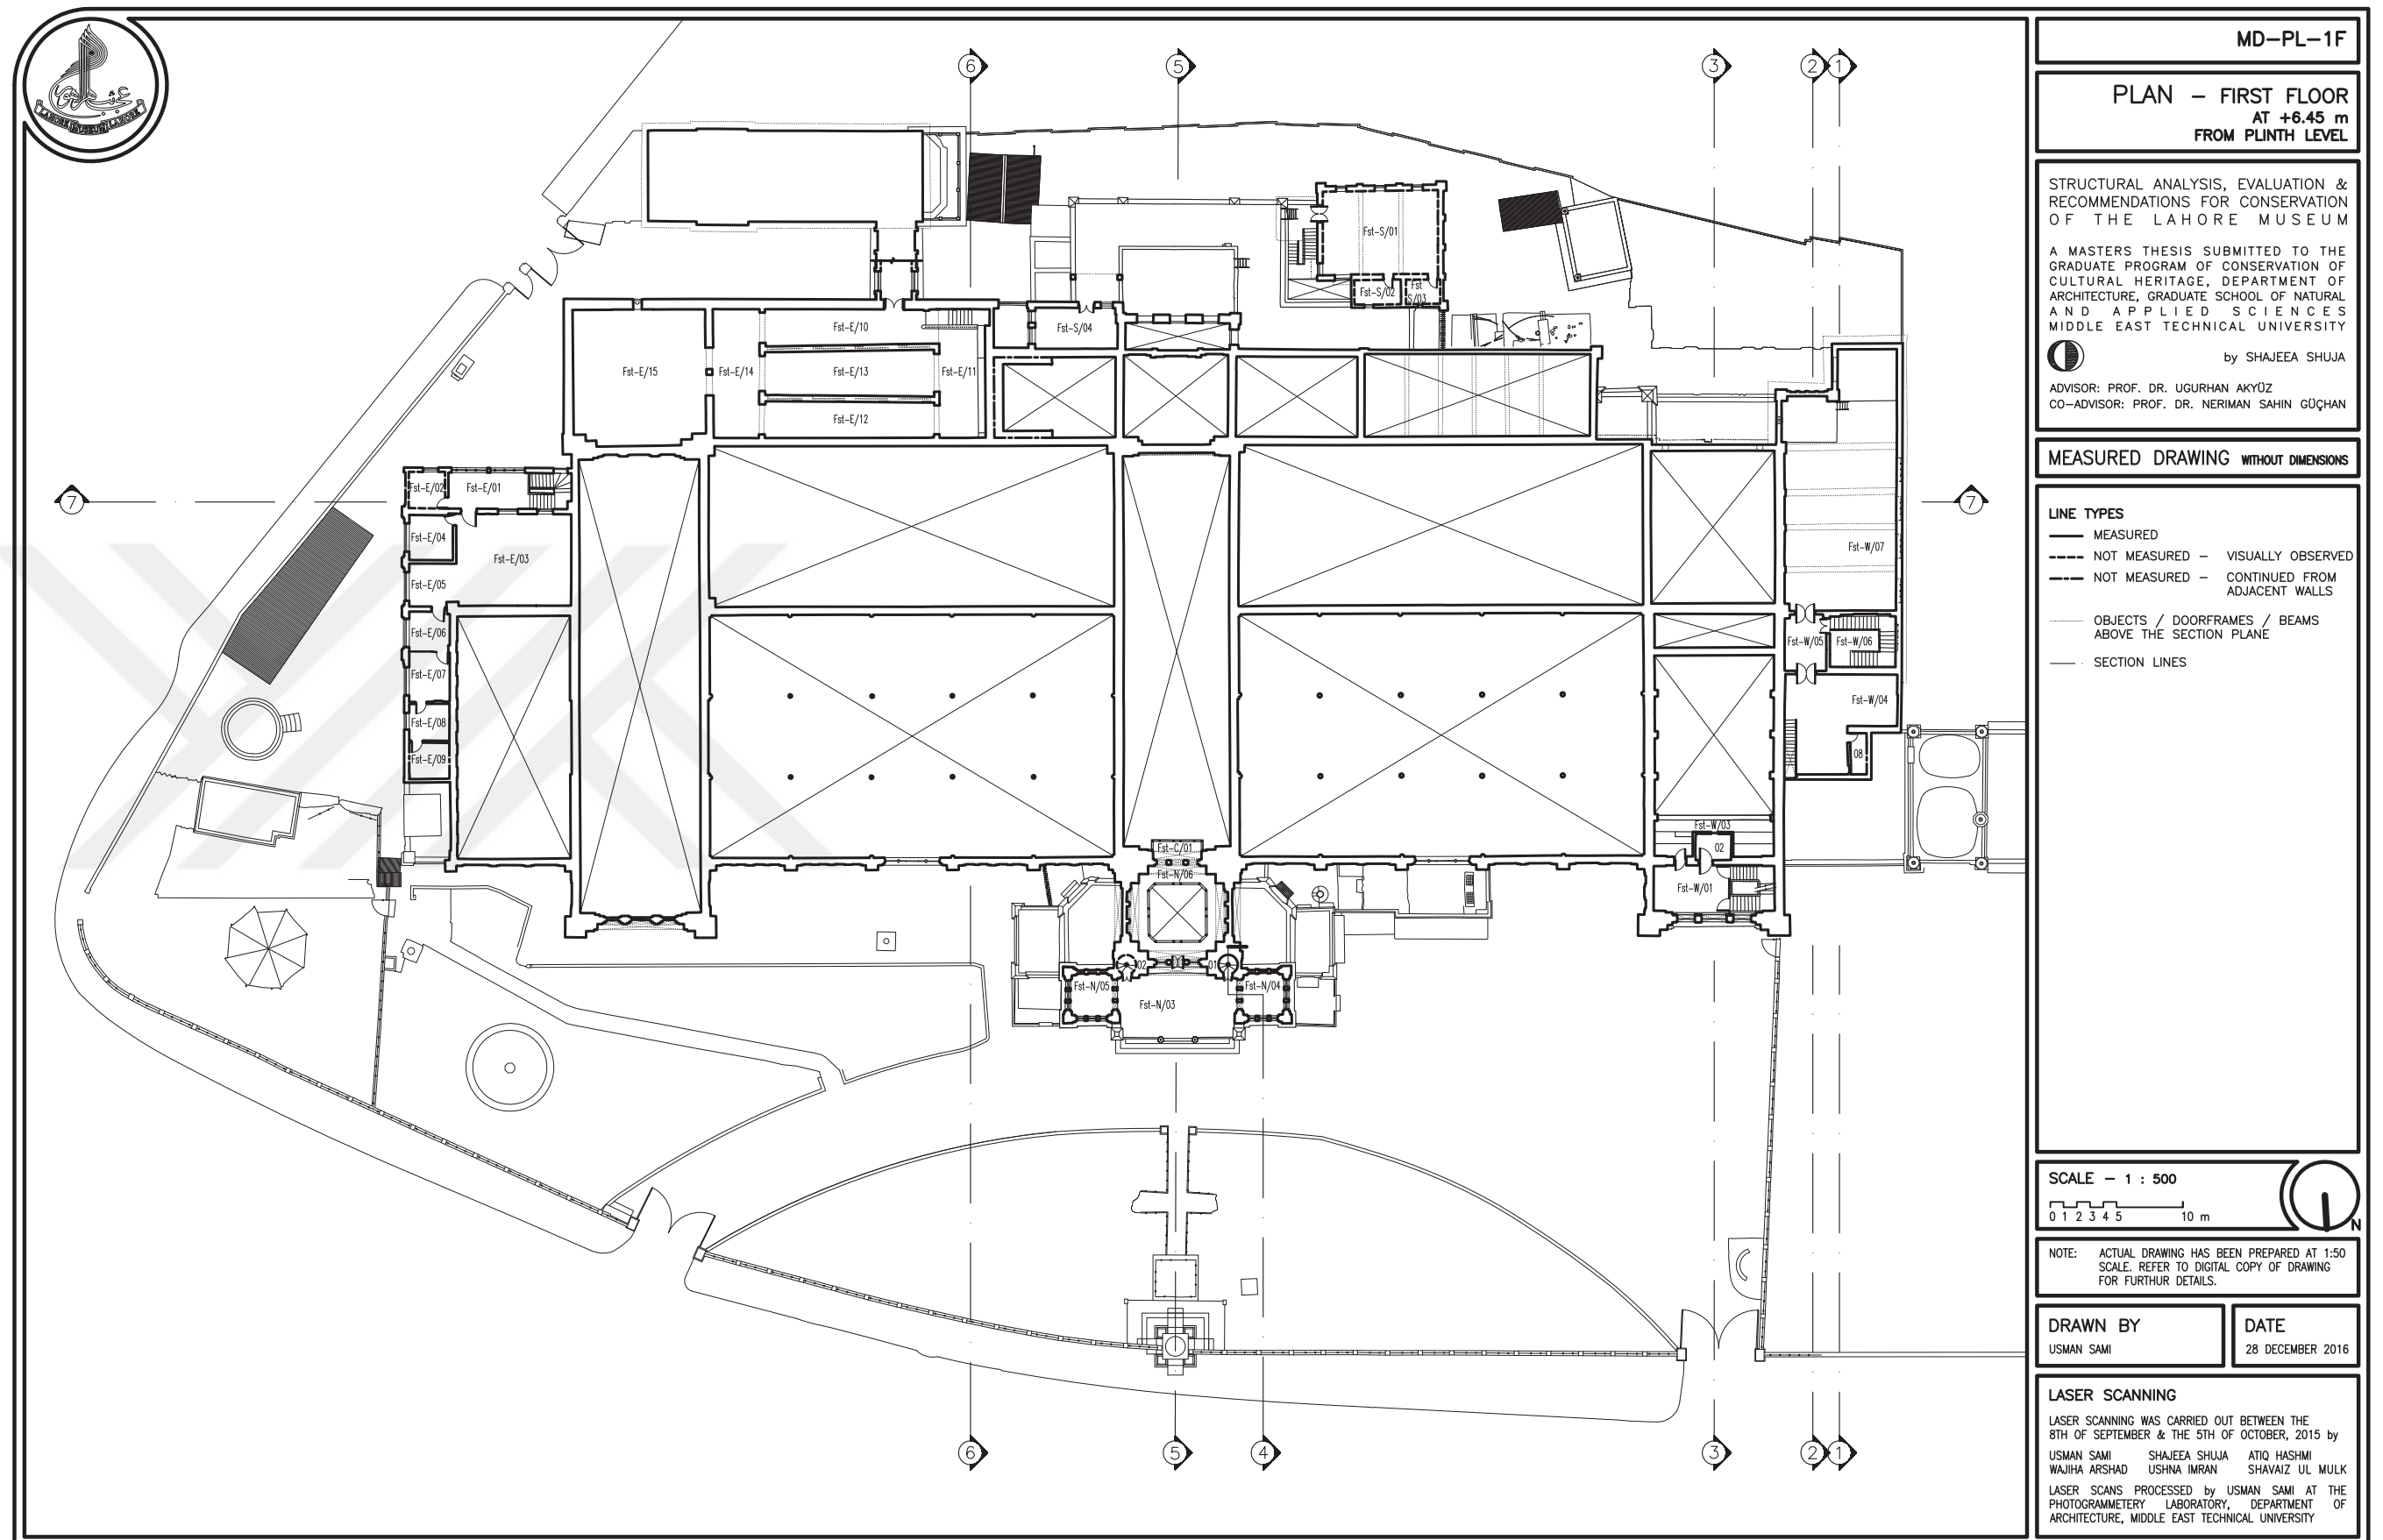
MD-PL-1F – Measured Drawing – Plan – First Floor (2016)
